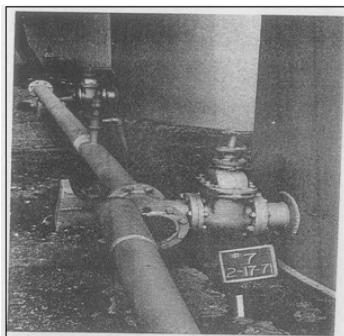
The pipe line has a shoe type support. Tank inlet-outlet connection broken at the flange, San Fernando earthquake, California, 1971, M=6.6 (damage)
